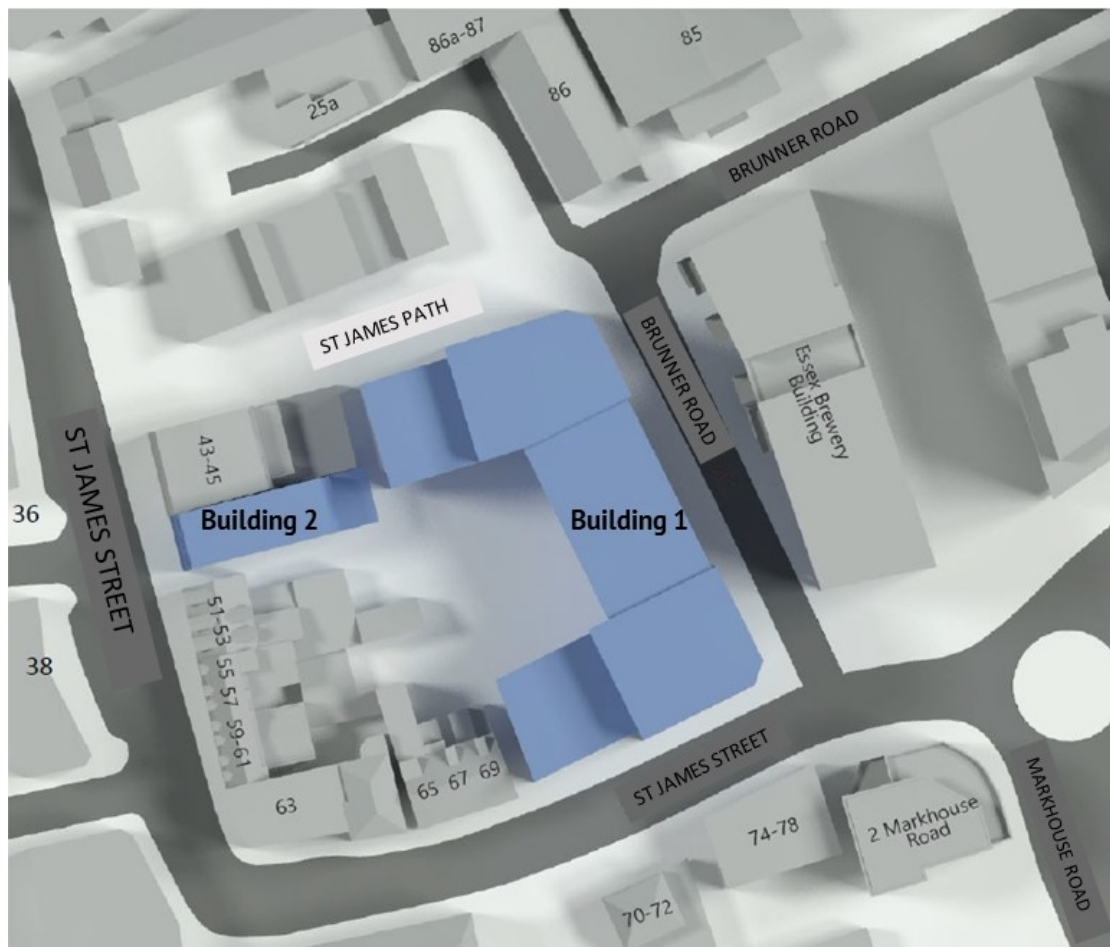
The surrounding neighbouring buildings to the proposed buildings.
